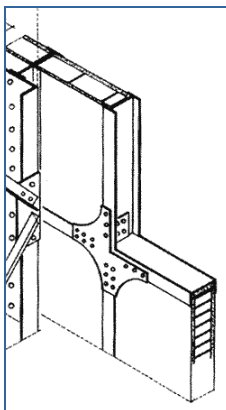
Detail of masonry wall in Istanbul's Silahtarağa Powerplant showing brick infill with horizontal and vertical light-frame steel "I" sections. (Kıraç et al, 2003) This construction is similar to that shown in Figure 35 below.
